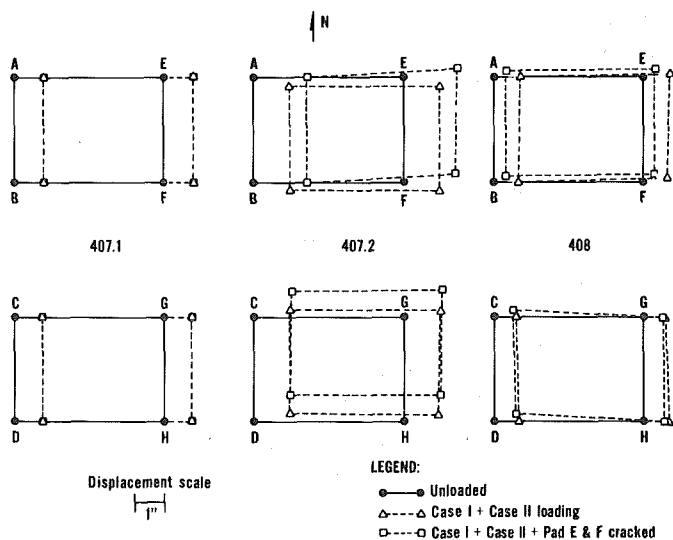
Longitudinal Displacements of Tops of Shoring Towers Under Various Loading Conditions
